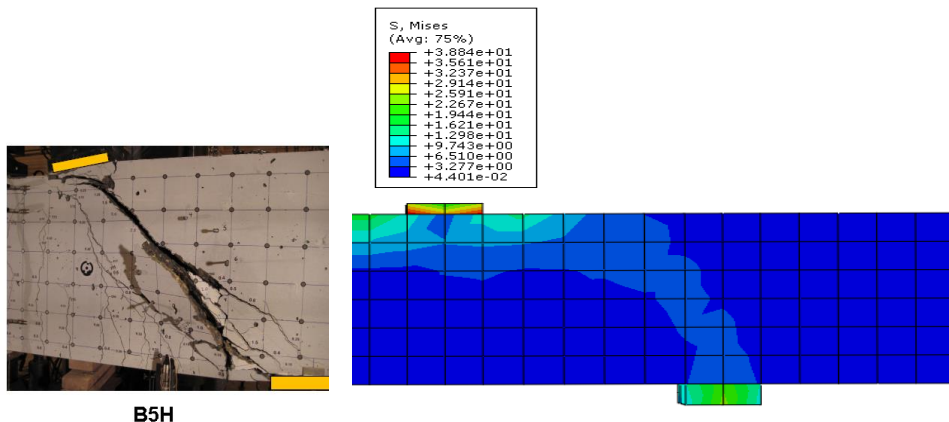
Experimental and Finite Element Pattern of Compression Strut Failure (S)for Specimen B5H
